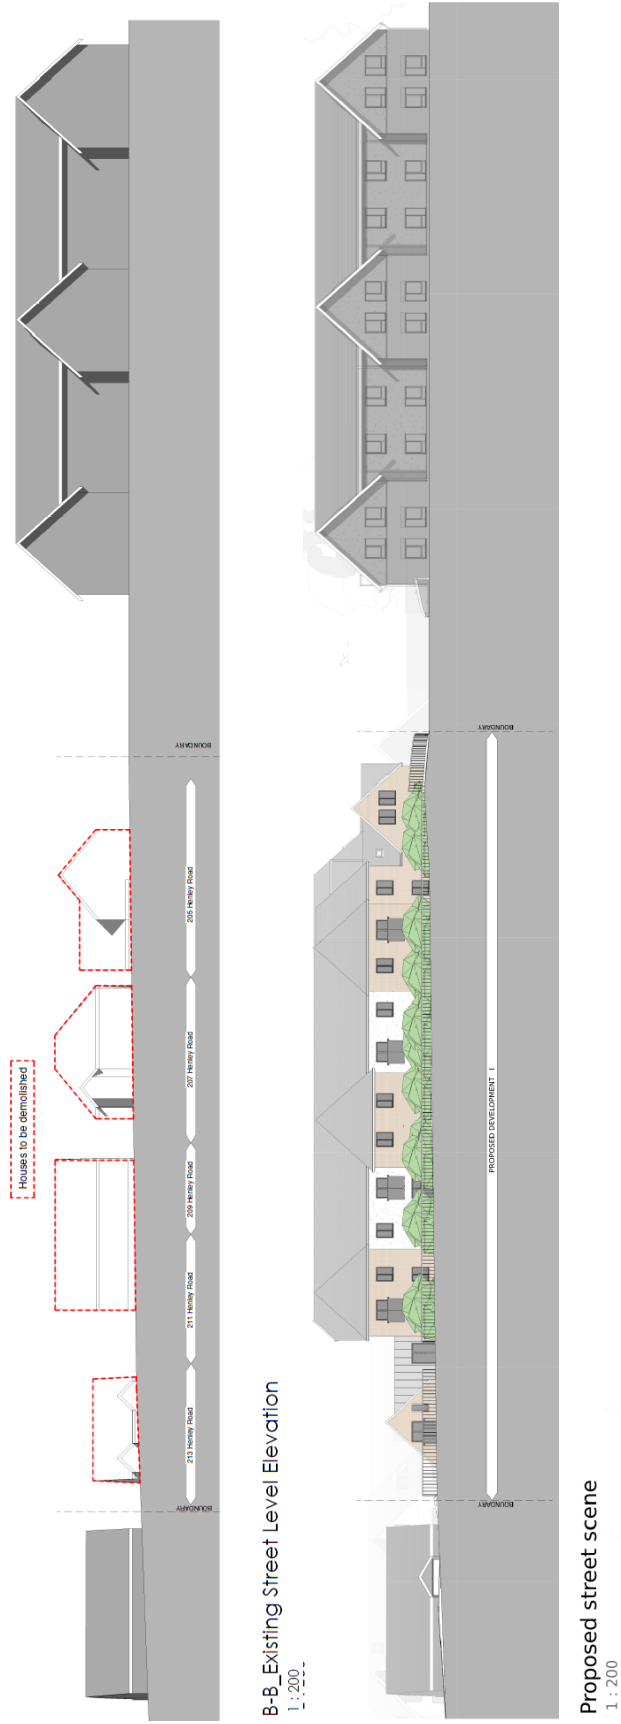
Part 2/3 - Existing and proposed front full elevations and streetscenes (taking account of topography) within the context of neighbouring buildings
